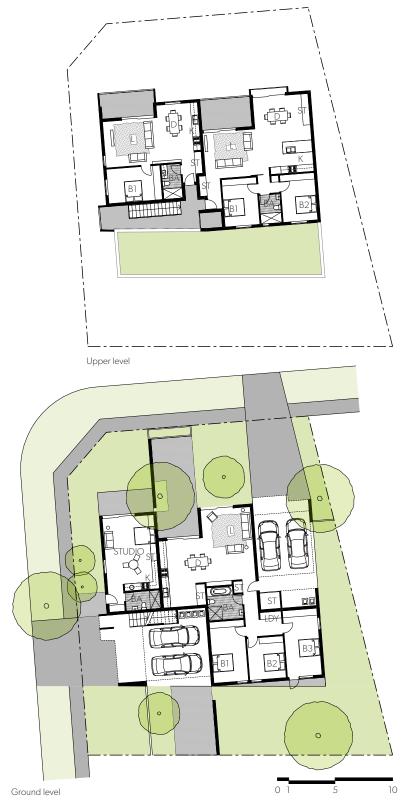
Sample plan of $\,$ manor house with four dwellings on corner site
